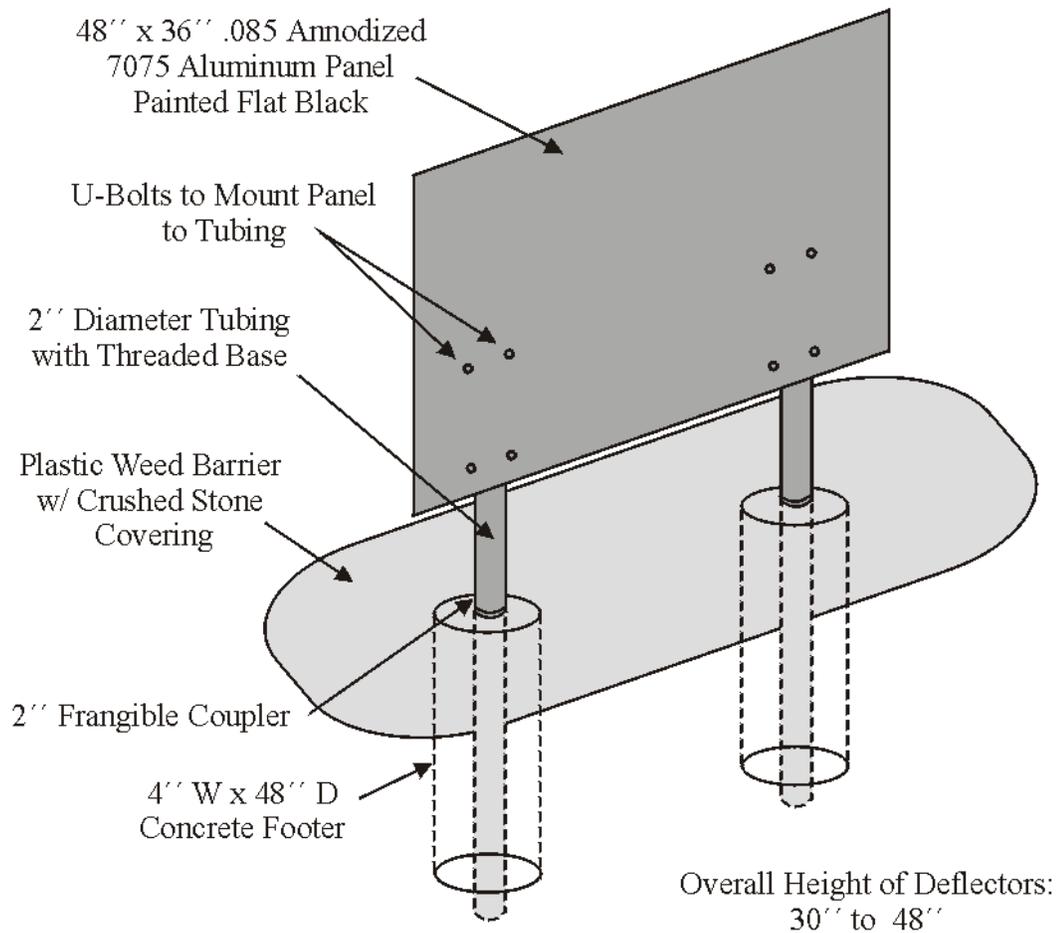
DEFLECTOR CONSTRUCTION DETAILS
